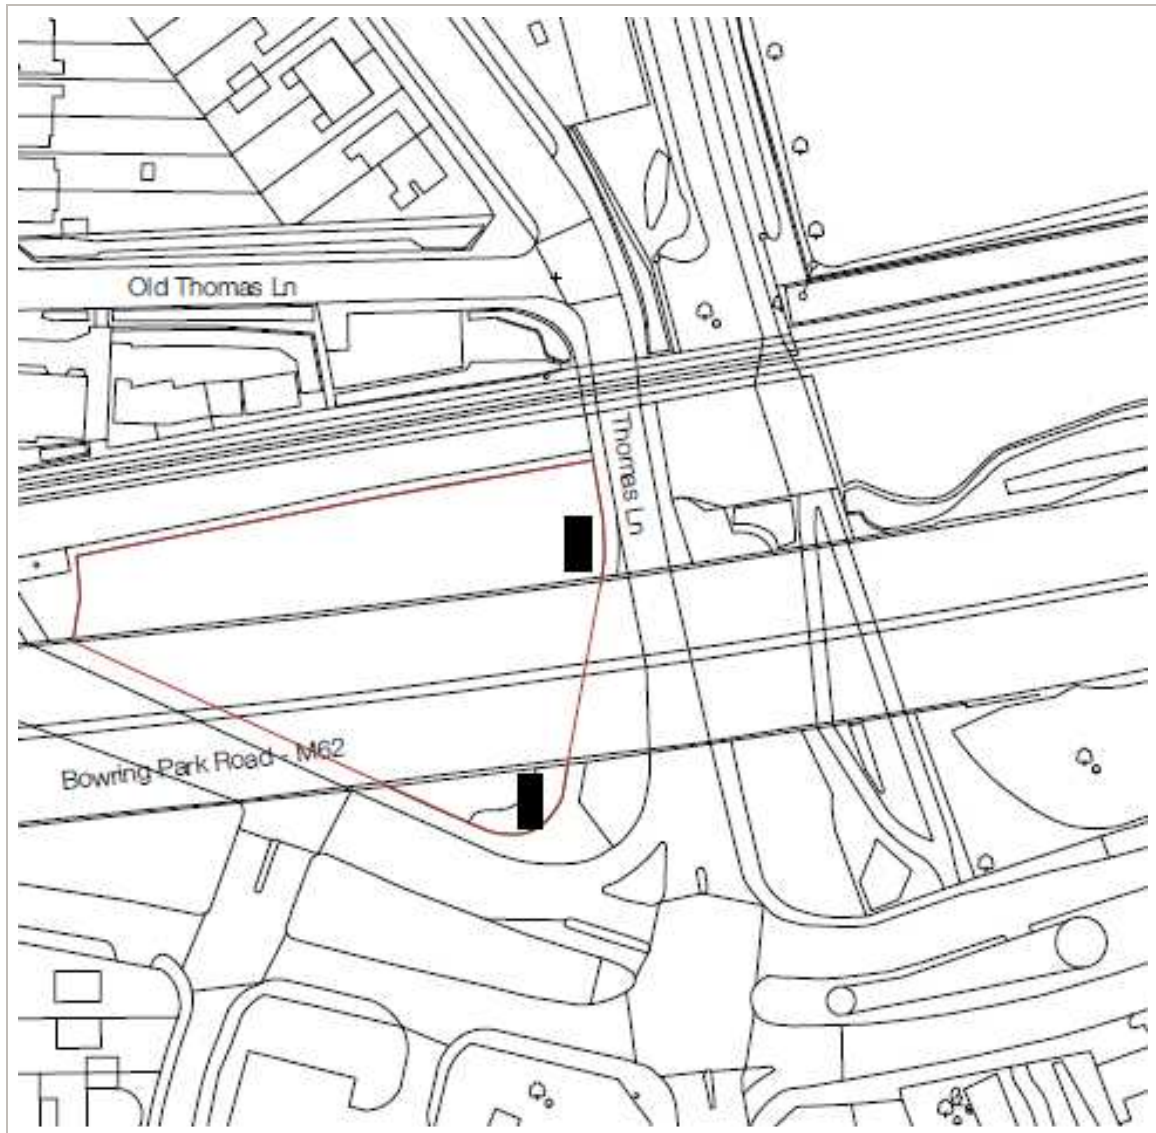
Existing Twin Advertising Towers Adjacent to the M62 – Site Location Plan
